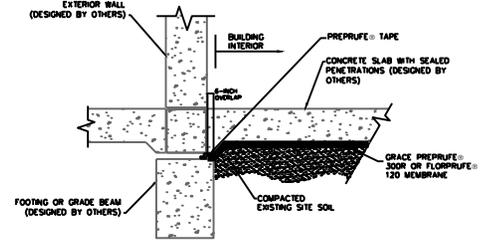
TYPICAL VAPOR BARRIER ASSEMBLY AT OUTSIDE CORNER
